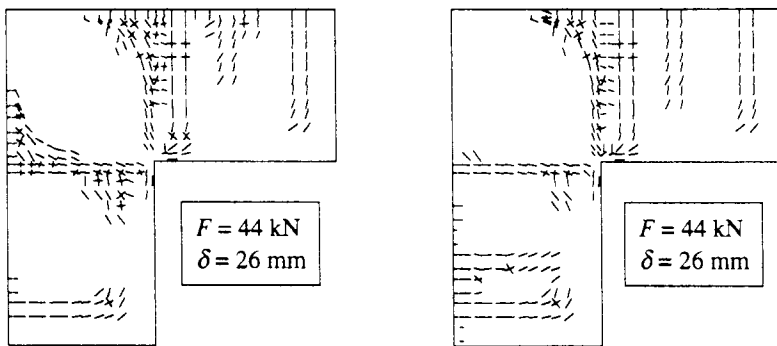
Difference in crack pattern in the corner area when using 50 % strength (left) and 90 % strength (right) for the concrete in the construction joint.
